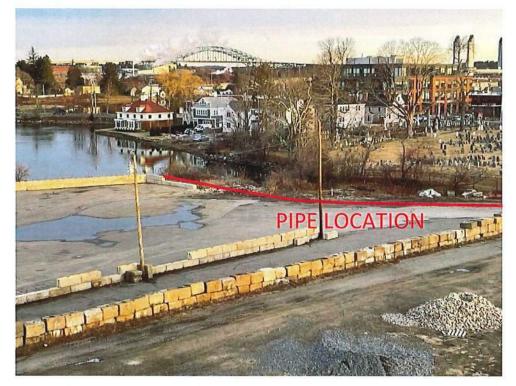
Looking northwest at outfall and 90 Maplewood Ave LLC lot area (left). Picture taken from Foundry Parking Garage. Taken 1/19/23
